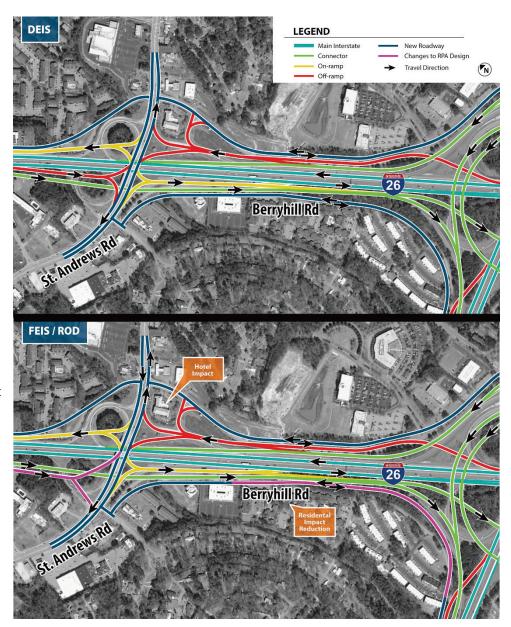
C Design changes to RA1 – I-26/ St. Andrews Road and Berryhill Road
